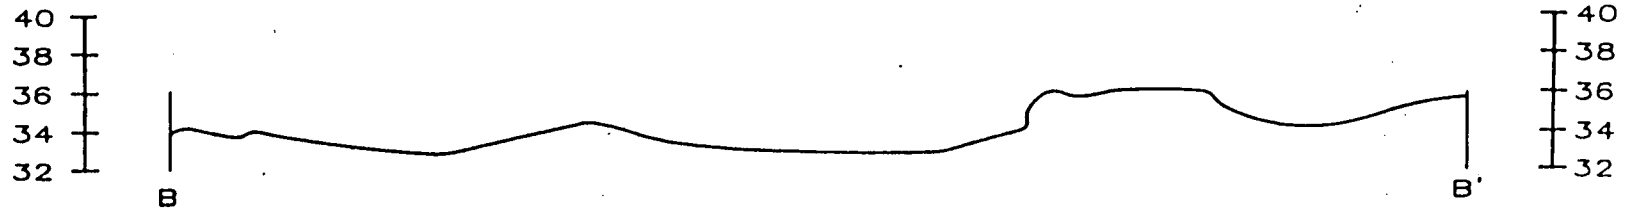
B. CROSS SECTION OF REROUTED OUTFALL
